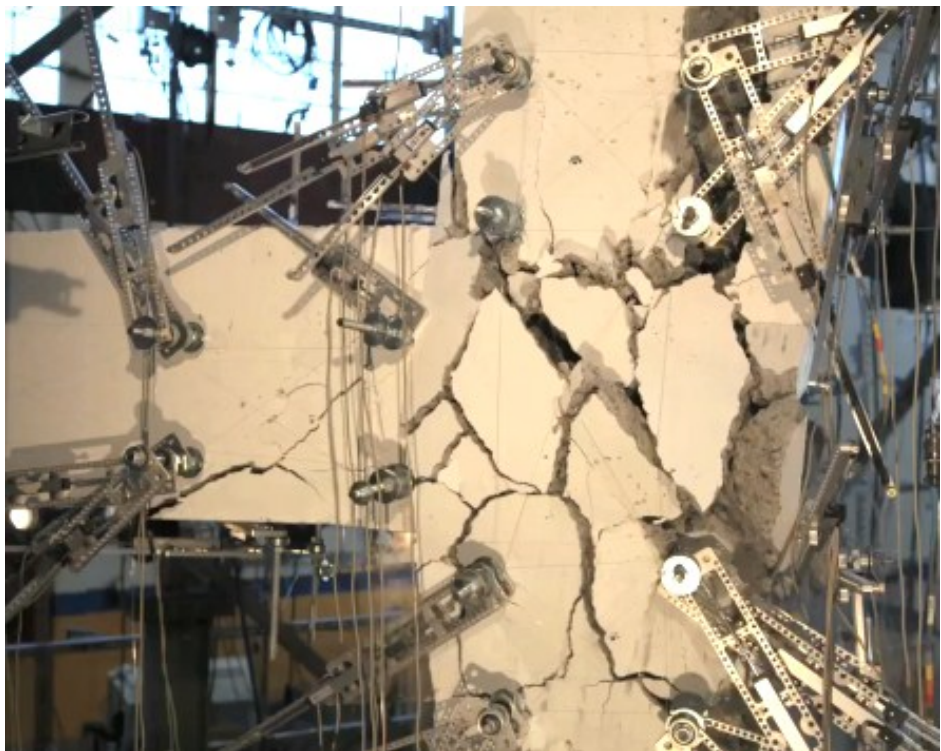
East joint face crack development and progression during NS beam loading of specimen U-BJ-1
